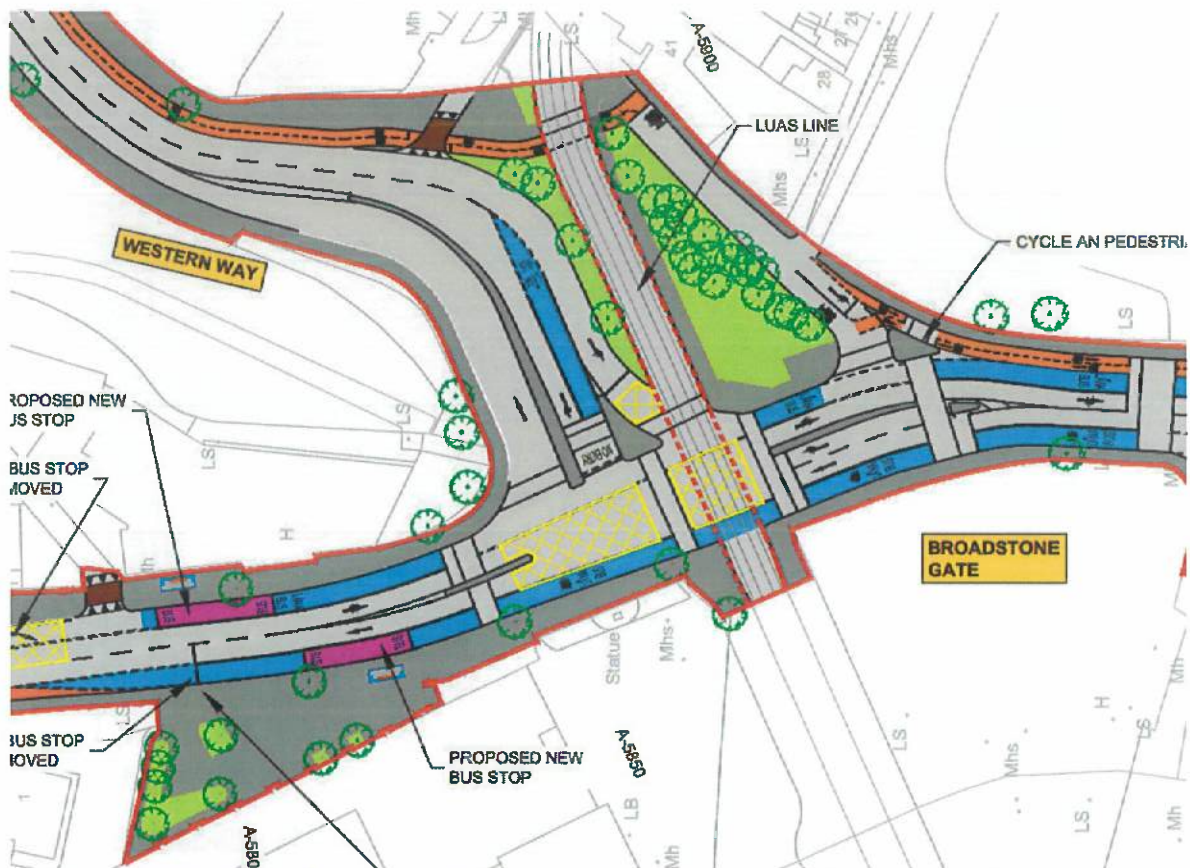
Junction between Phibsborough Road/Western Way/Constitution Hill with a five-stage pedestrian crossing
